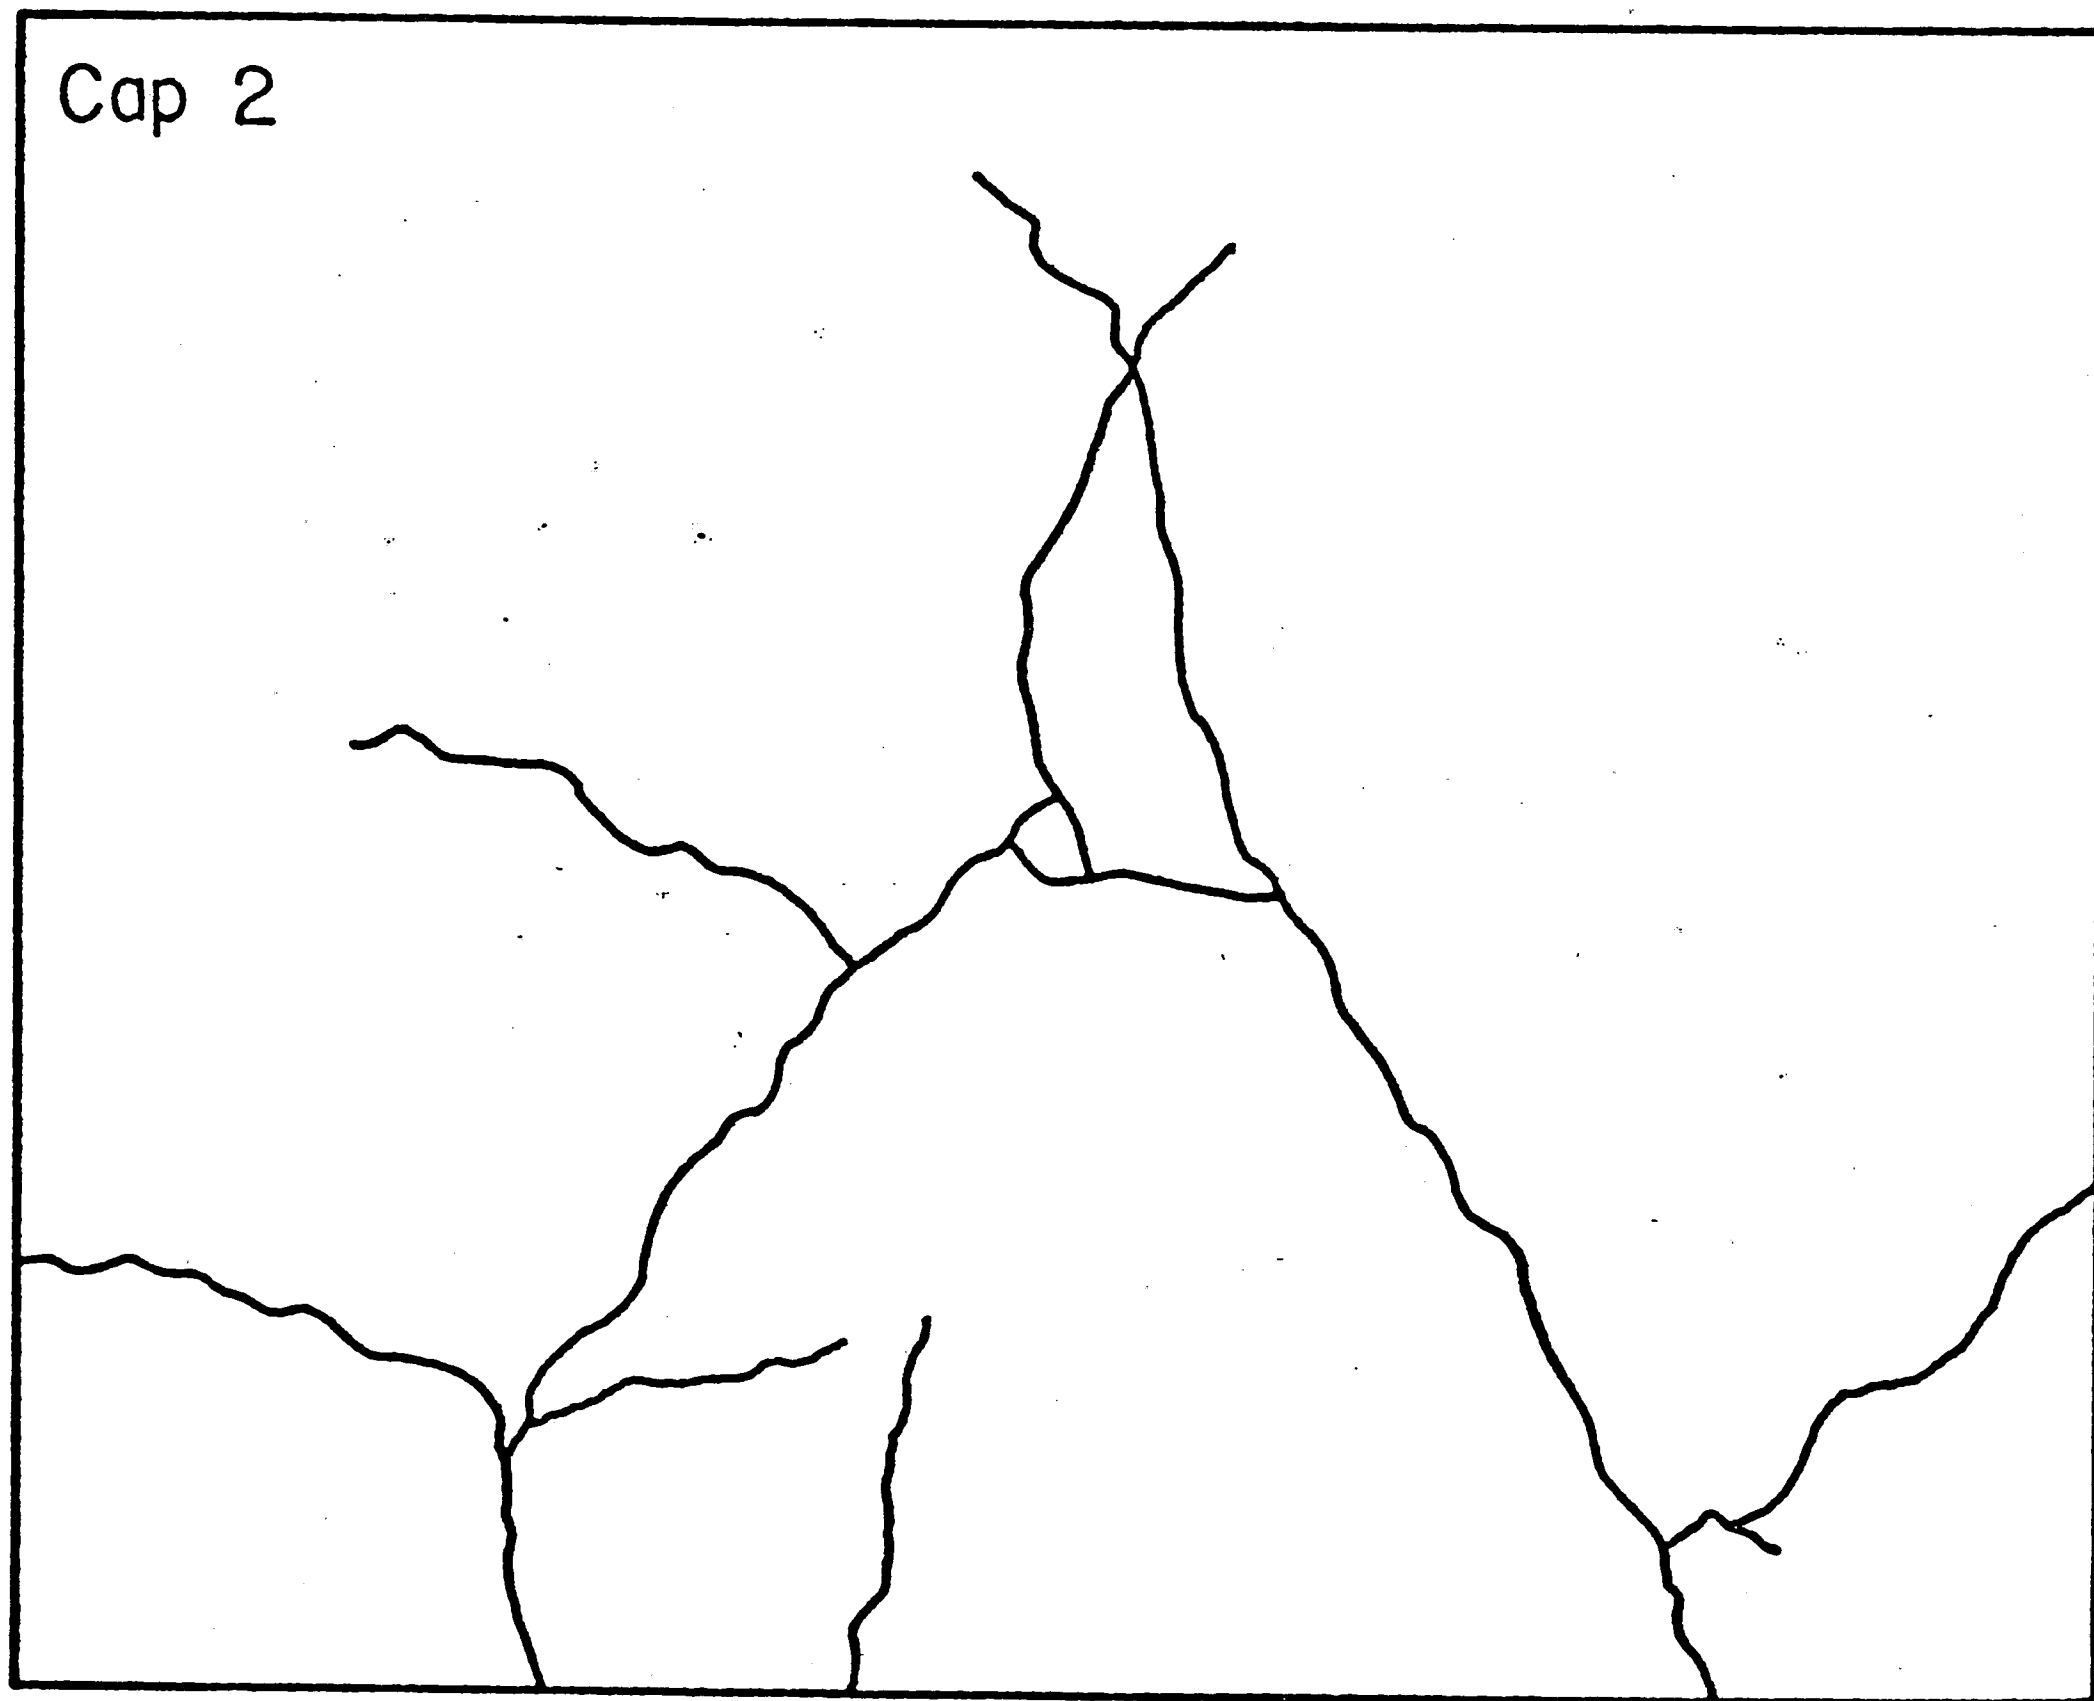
WEST END OF PILE CAP 2 - CRACK PATTERNS
